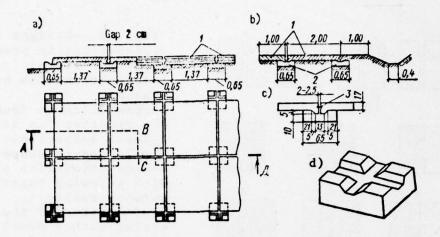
Slabs with dowel connections laid on figured, angular foundations: a-cross section along ABOD; b-detail adjoining the pavement to the shoulder; c-detail of the junction; d-angular foundation (locking slab); 1-Slabs; 2-Foundation; 3-Dowel.
